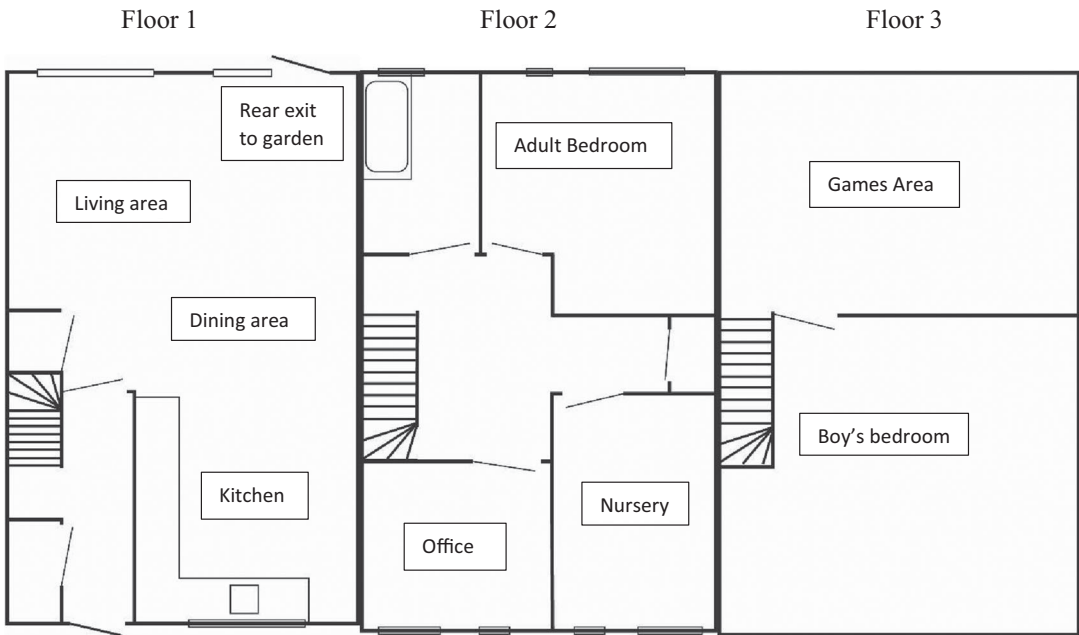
Floor plan and interiors of floors 1, 2, and 3
